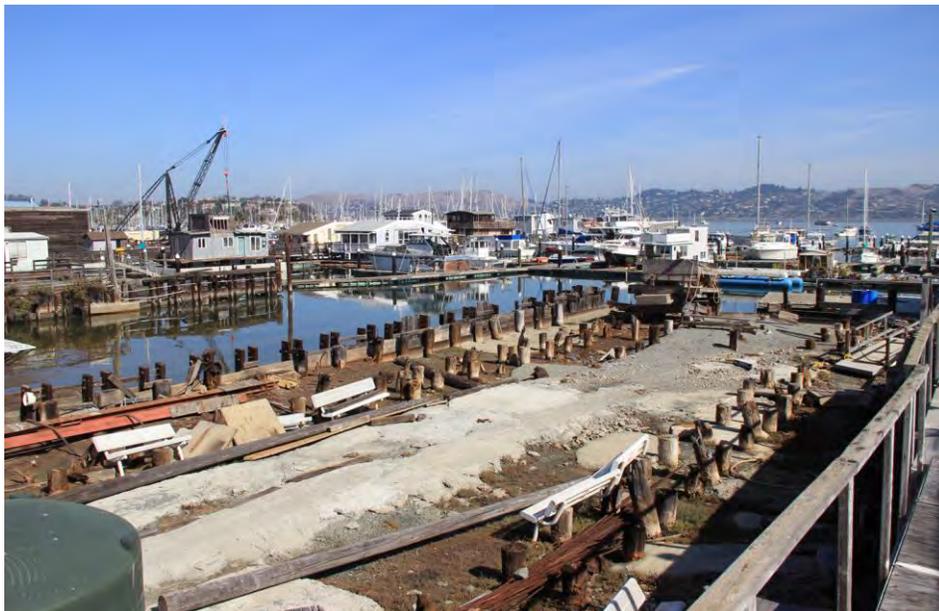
Pier adjoining Shipway 2 to the northwest, looking northeast, 2015
